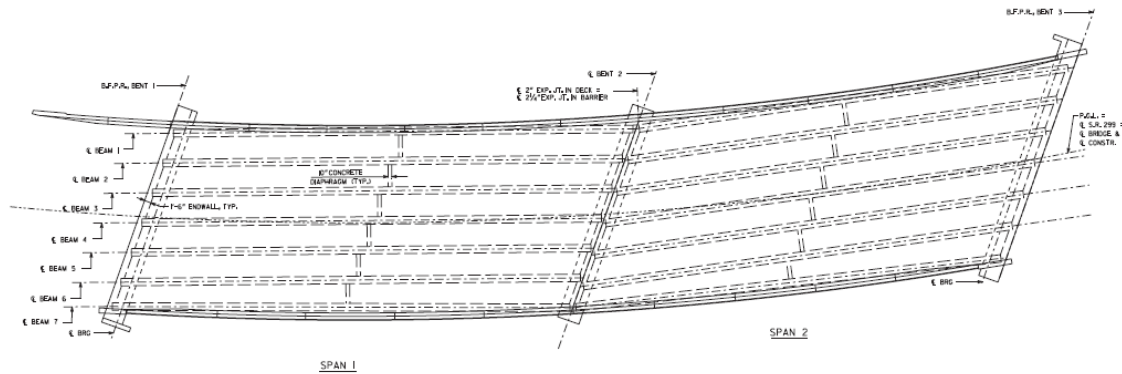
SR299 bridge superstructure plan (GDOT-DRW, 2016).
